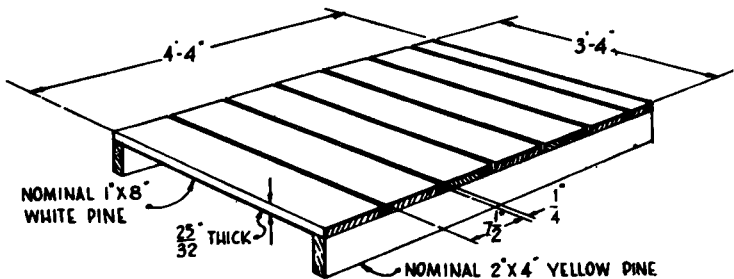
(d). Construction of Test Deck for other than Wood Shingles and Shakes.
